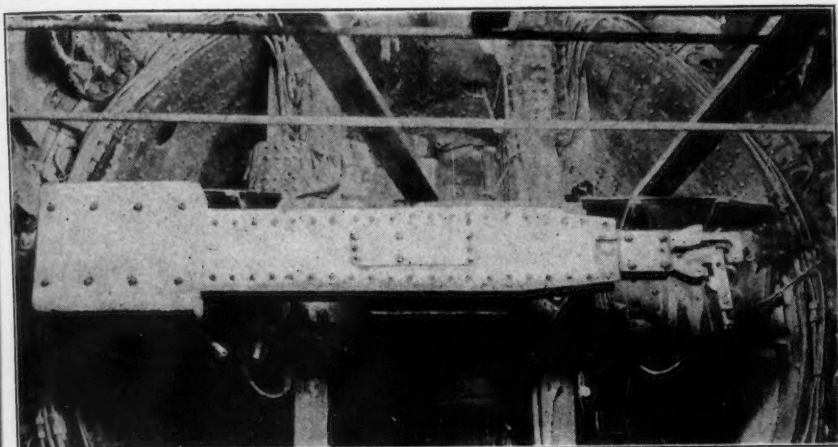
OUTSIDE DETAIL OF ERECTOR.
